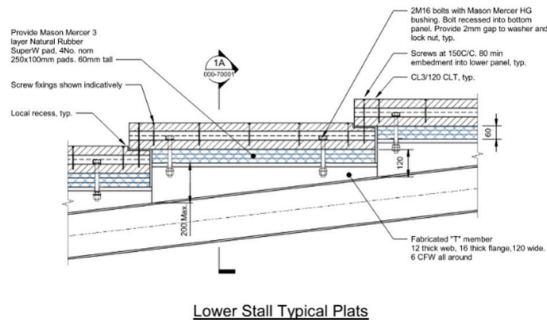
Typical detail of stalls CLT (Courtesy: Arup)
